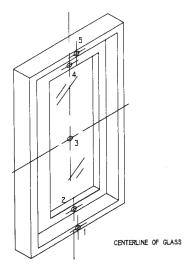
Thermocouple Location: Horizontal Sliding Window, Casement, or Sliding Glass Door
